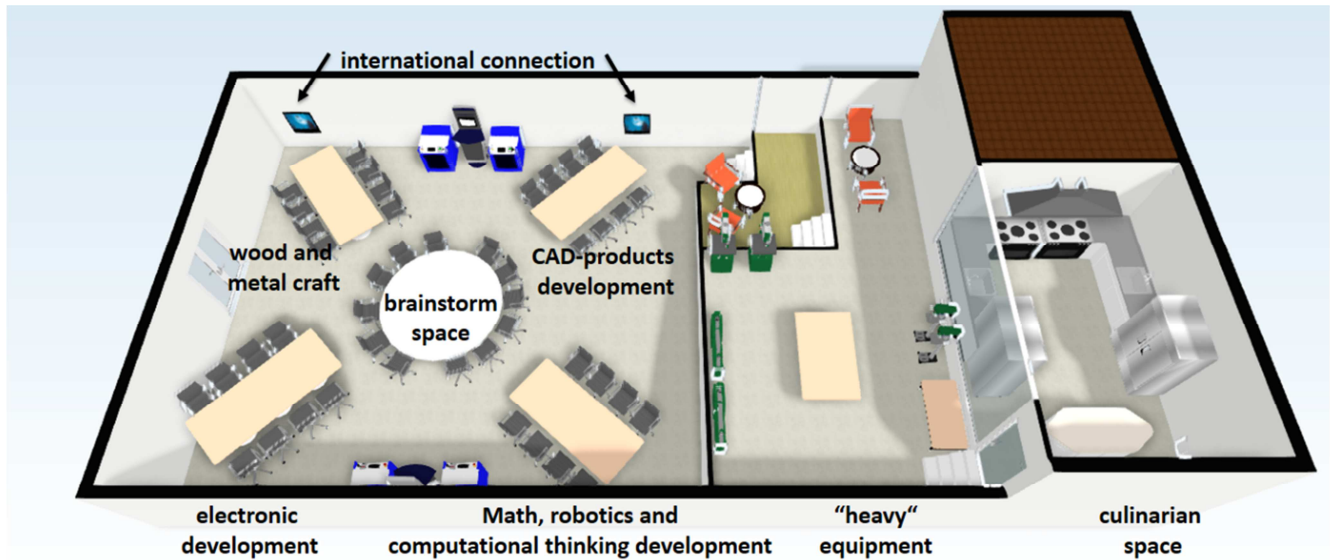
Initial sketch of the Innovation Center and its working spaces – ground floor.
